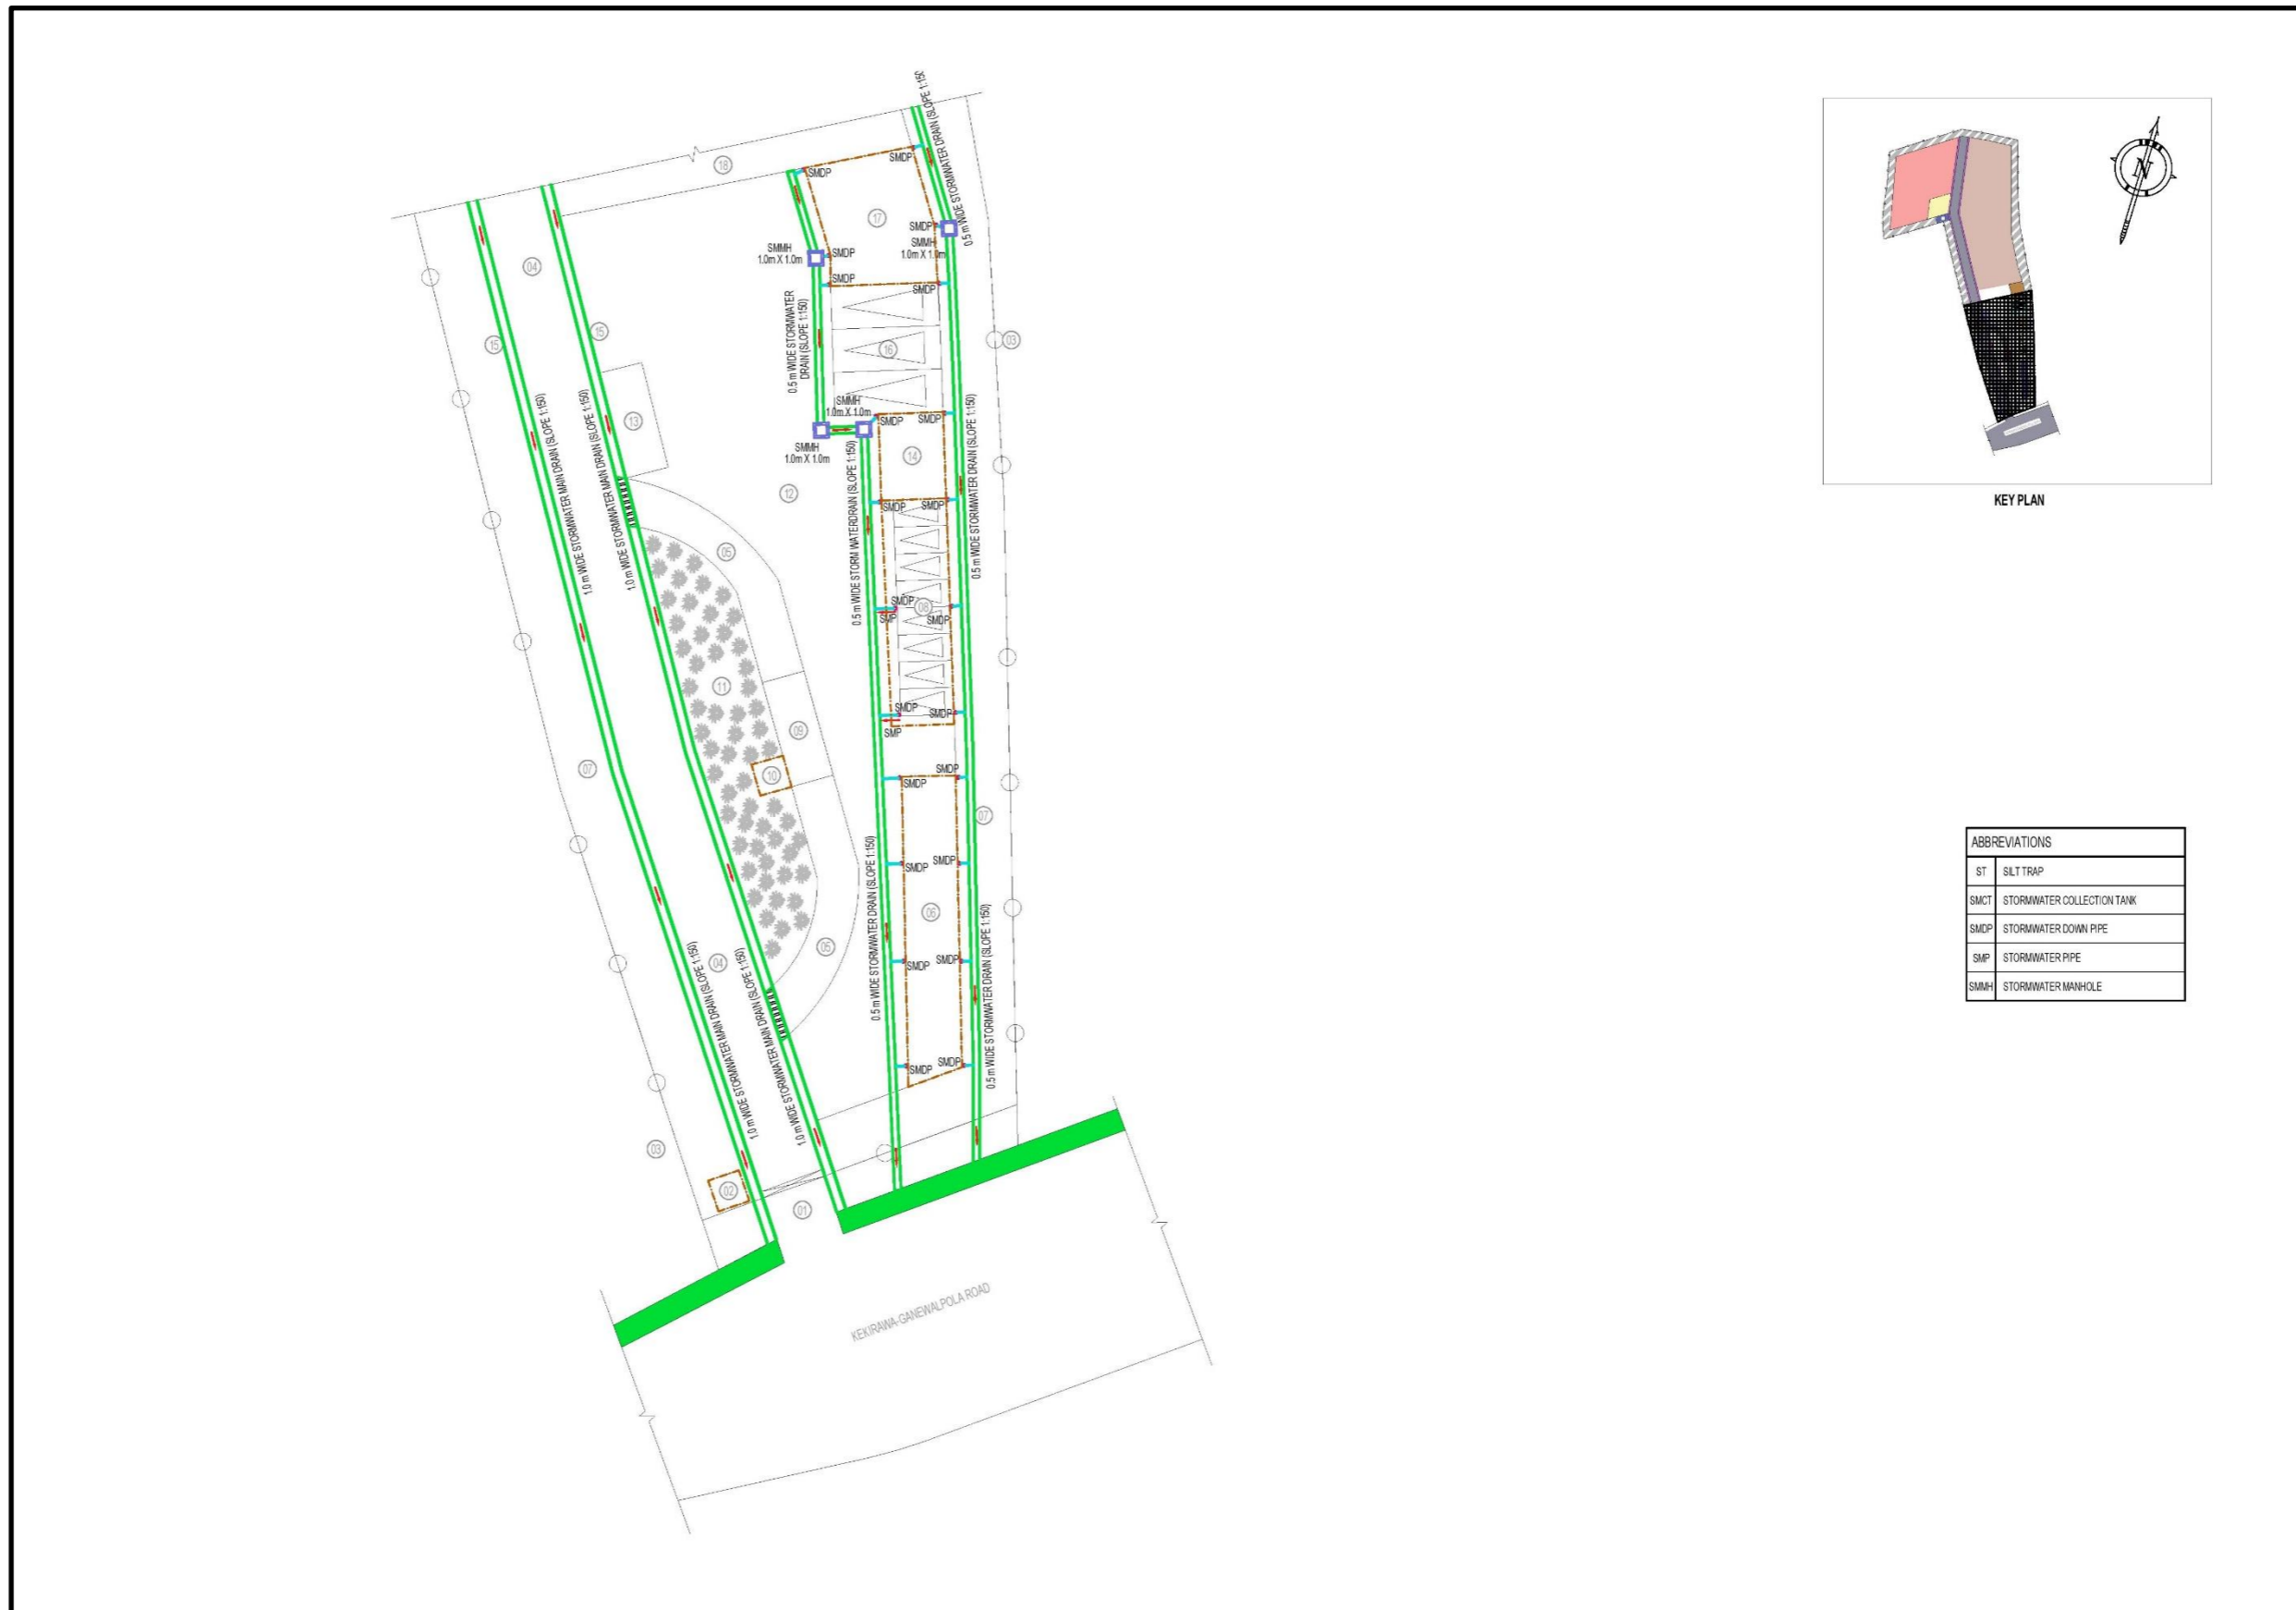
Stormwater drainage system of the proposed ISWM facility (Part 2)
